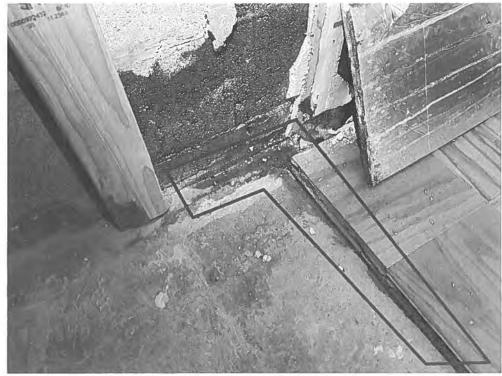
View of Water Infiltration Observed in the East Wall Due to Past Rain Event
